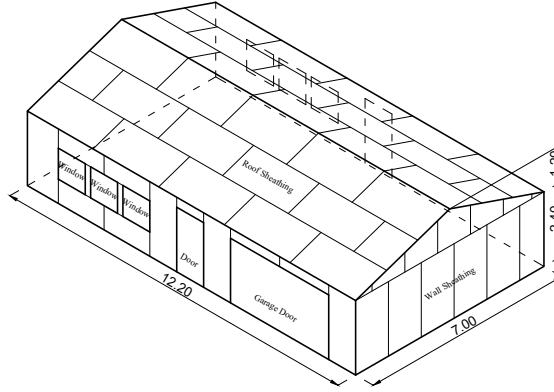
Typical residential building adapted from *Yau* (2011).
